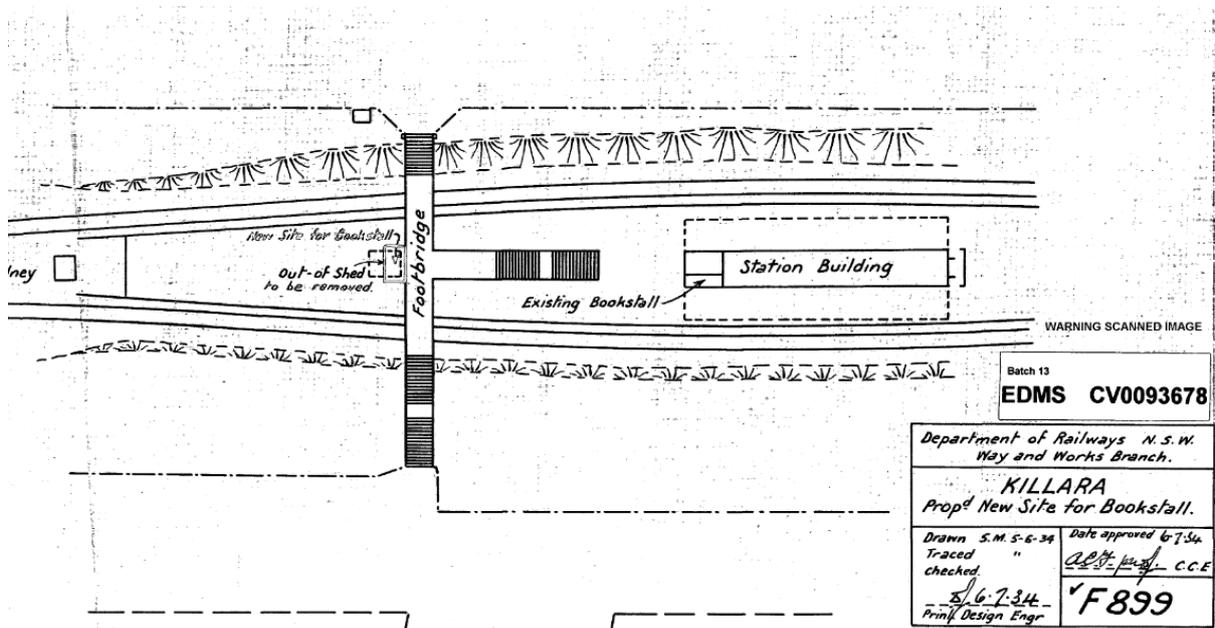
Plan for removal of out-of shed for a new bookstall, c. 1934 (Sydney Trains Virtual Plan Room)
